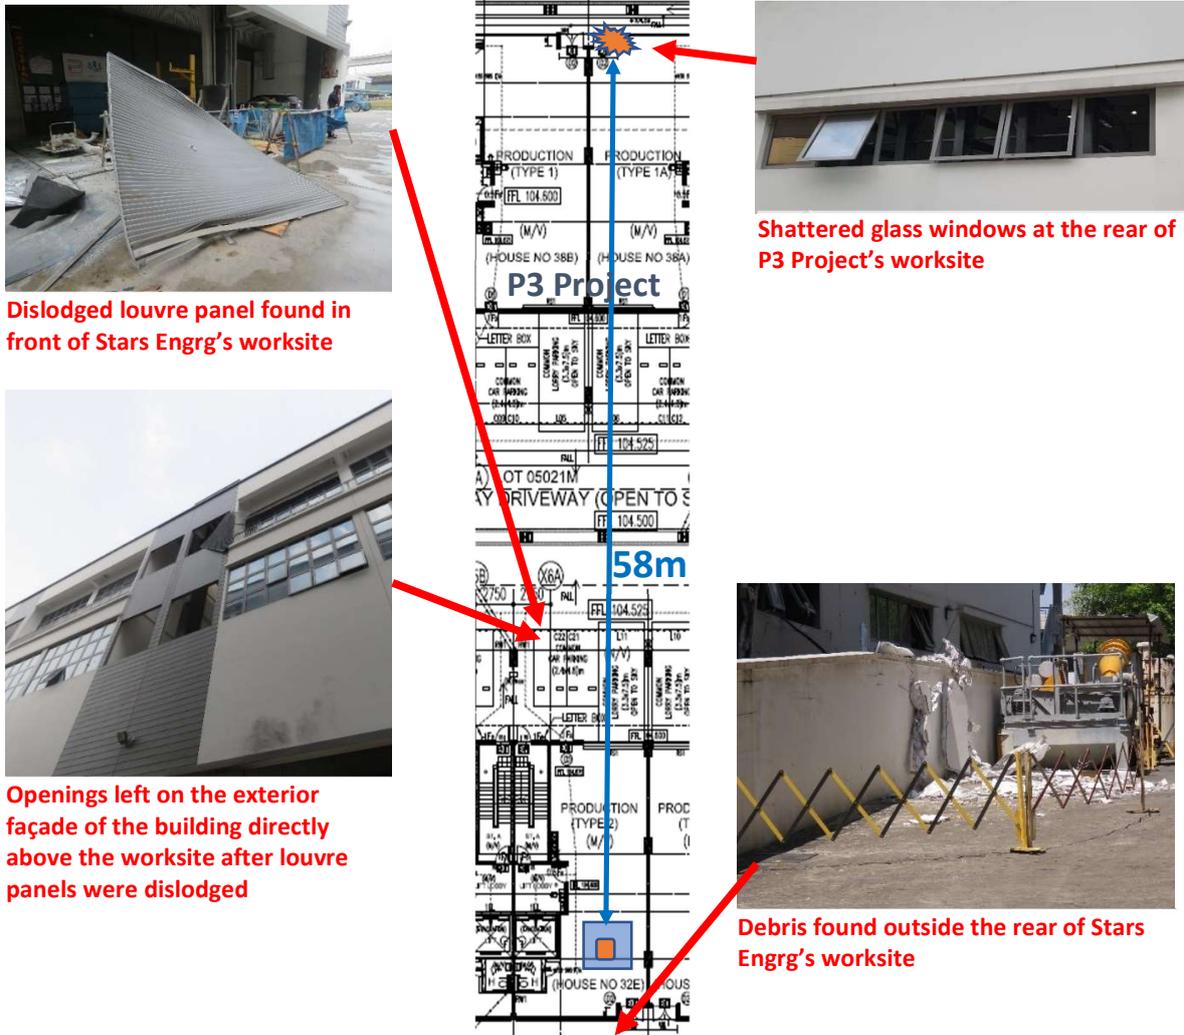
Damage overlaid on layout plan, from the Tuas Site to P3 Project's rear windows
